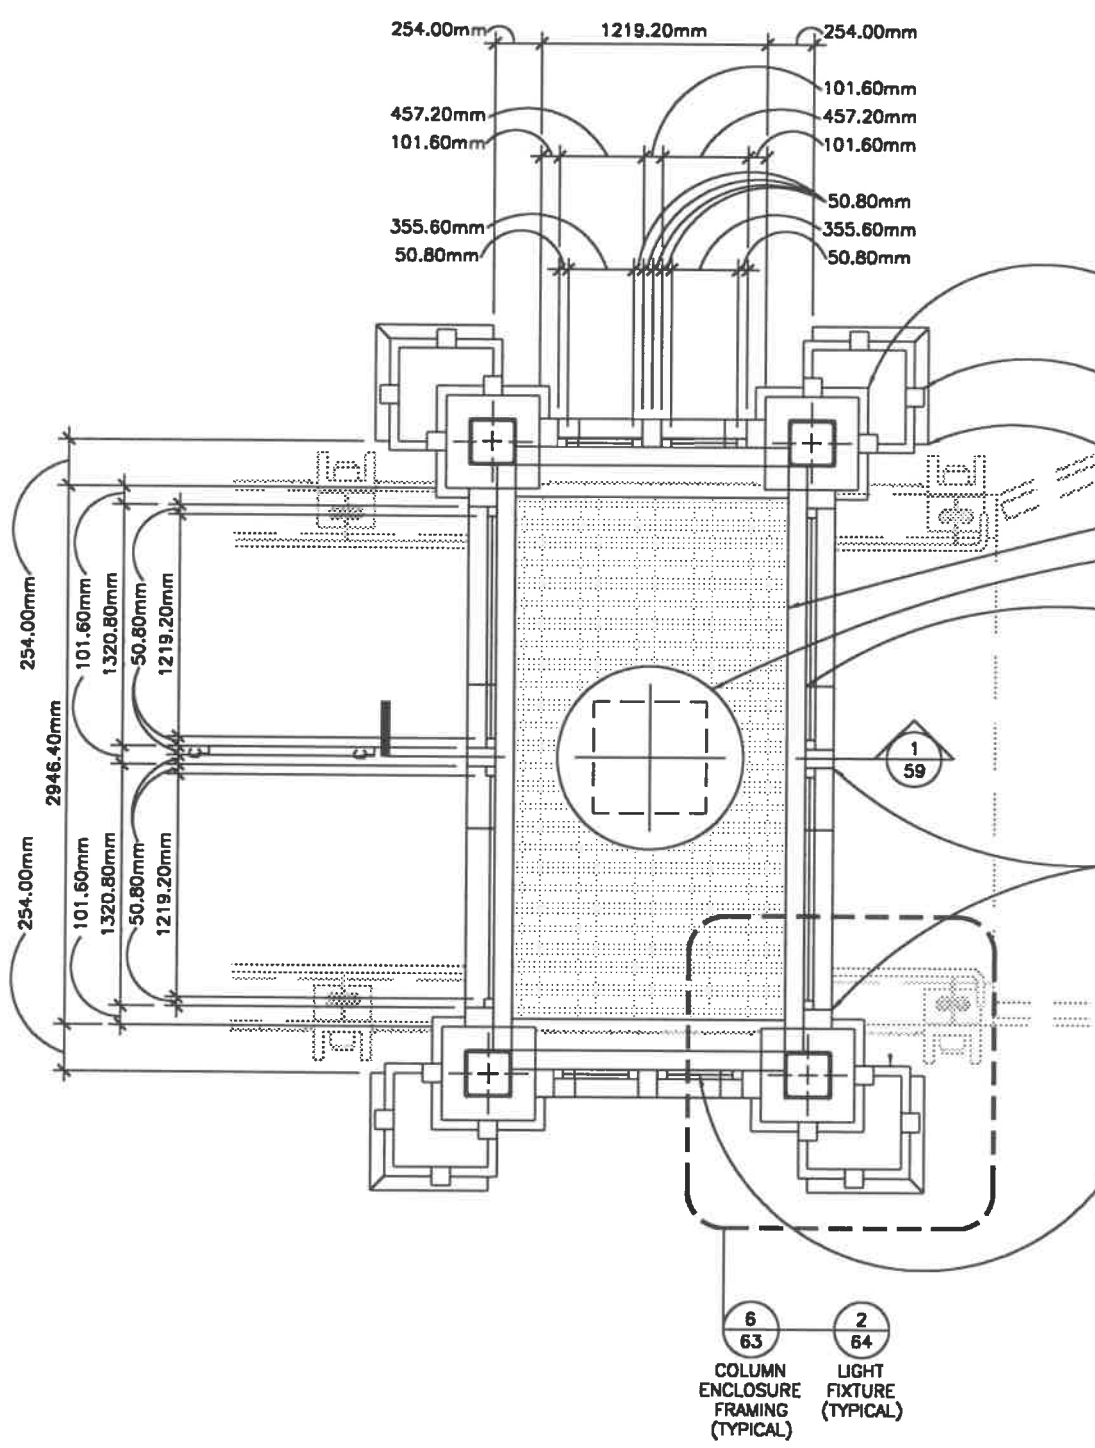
DETAIL - NEW PARTIAL BRIDGE PLAN @ LIGHT FIXTURE "D" PLATFORM / LIGHT FIXTURE "E" LEVEL
